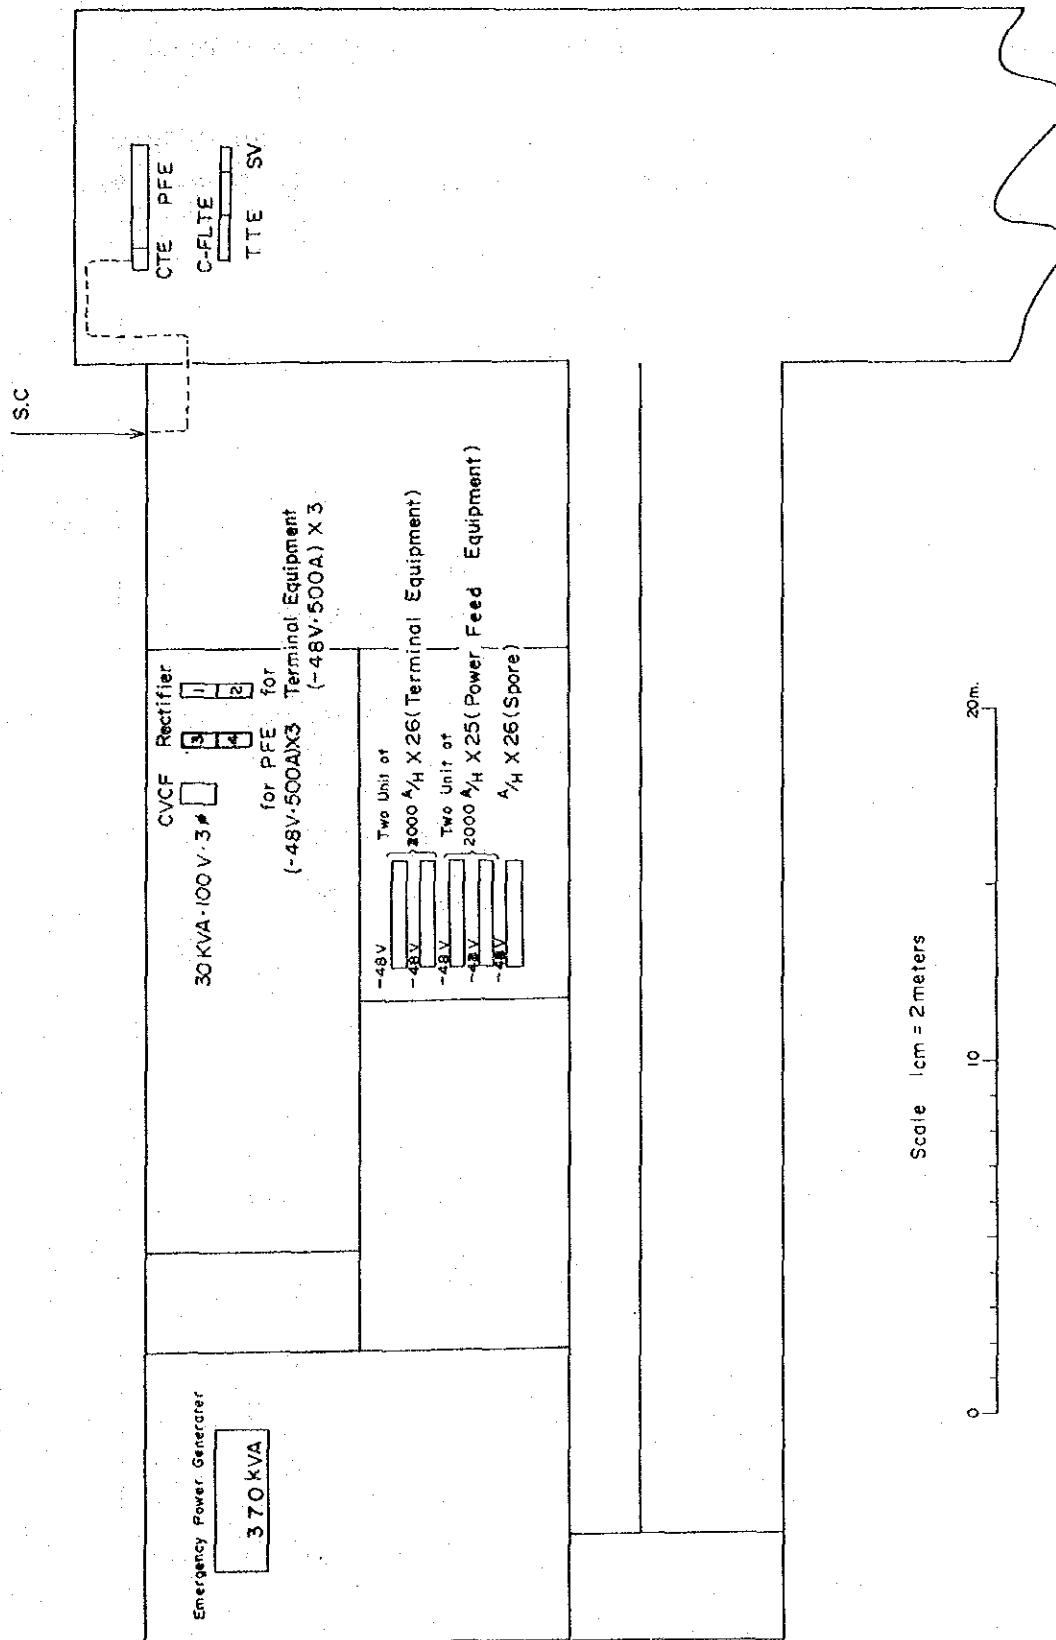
Arrangement of Terminal Equipment and Power Facilities at Kota Kinabalu Landing Station
